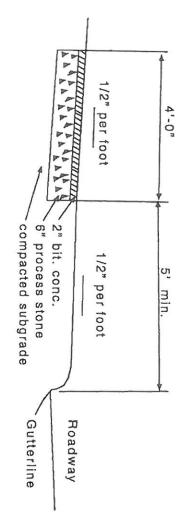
SUPER ELEVATION OF ROADWAY ON CURVE NOT TO SCALE
